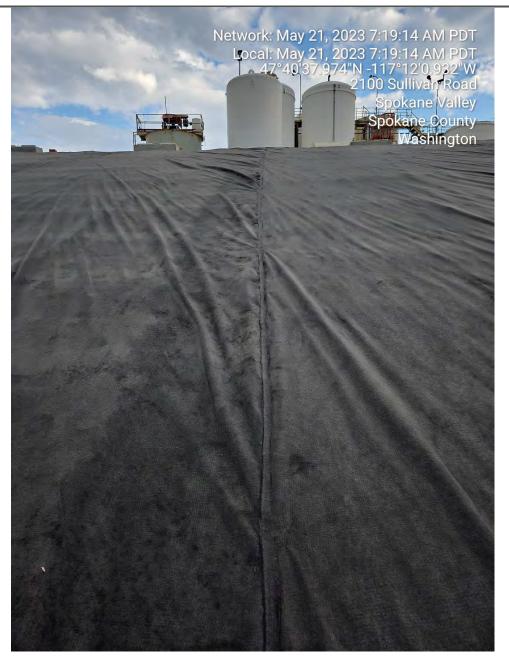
Repair of burn hole on 15th seam weld from the west using spare patch of geotextile.
